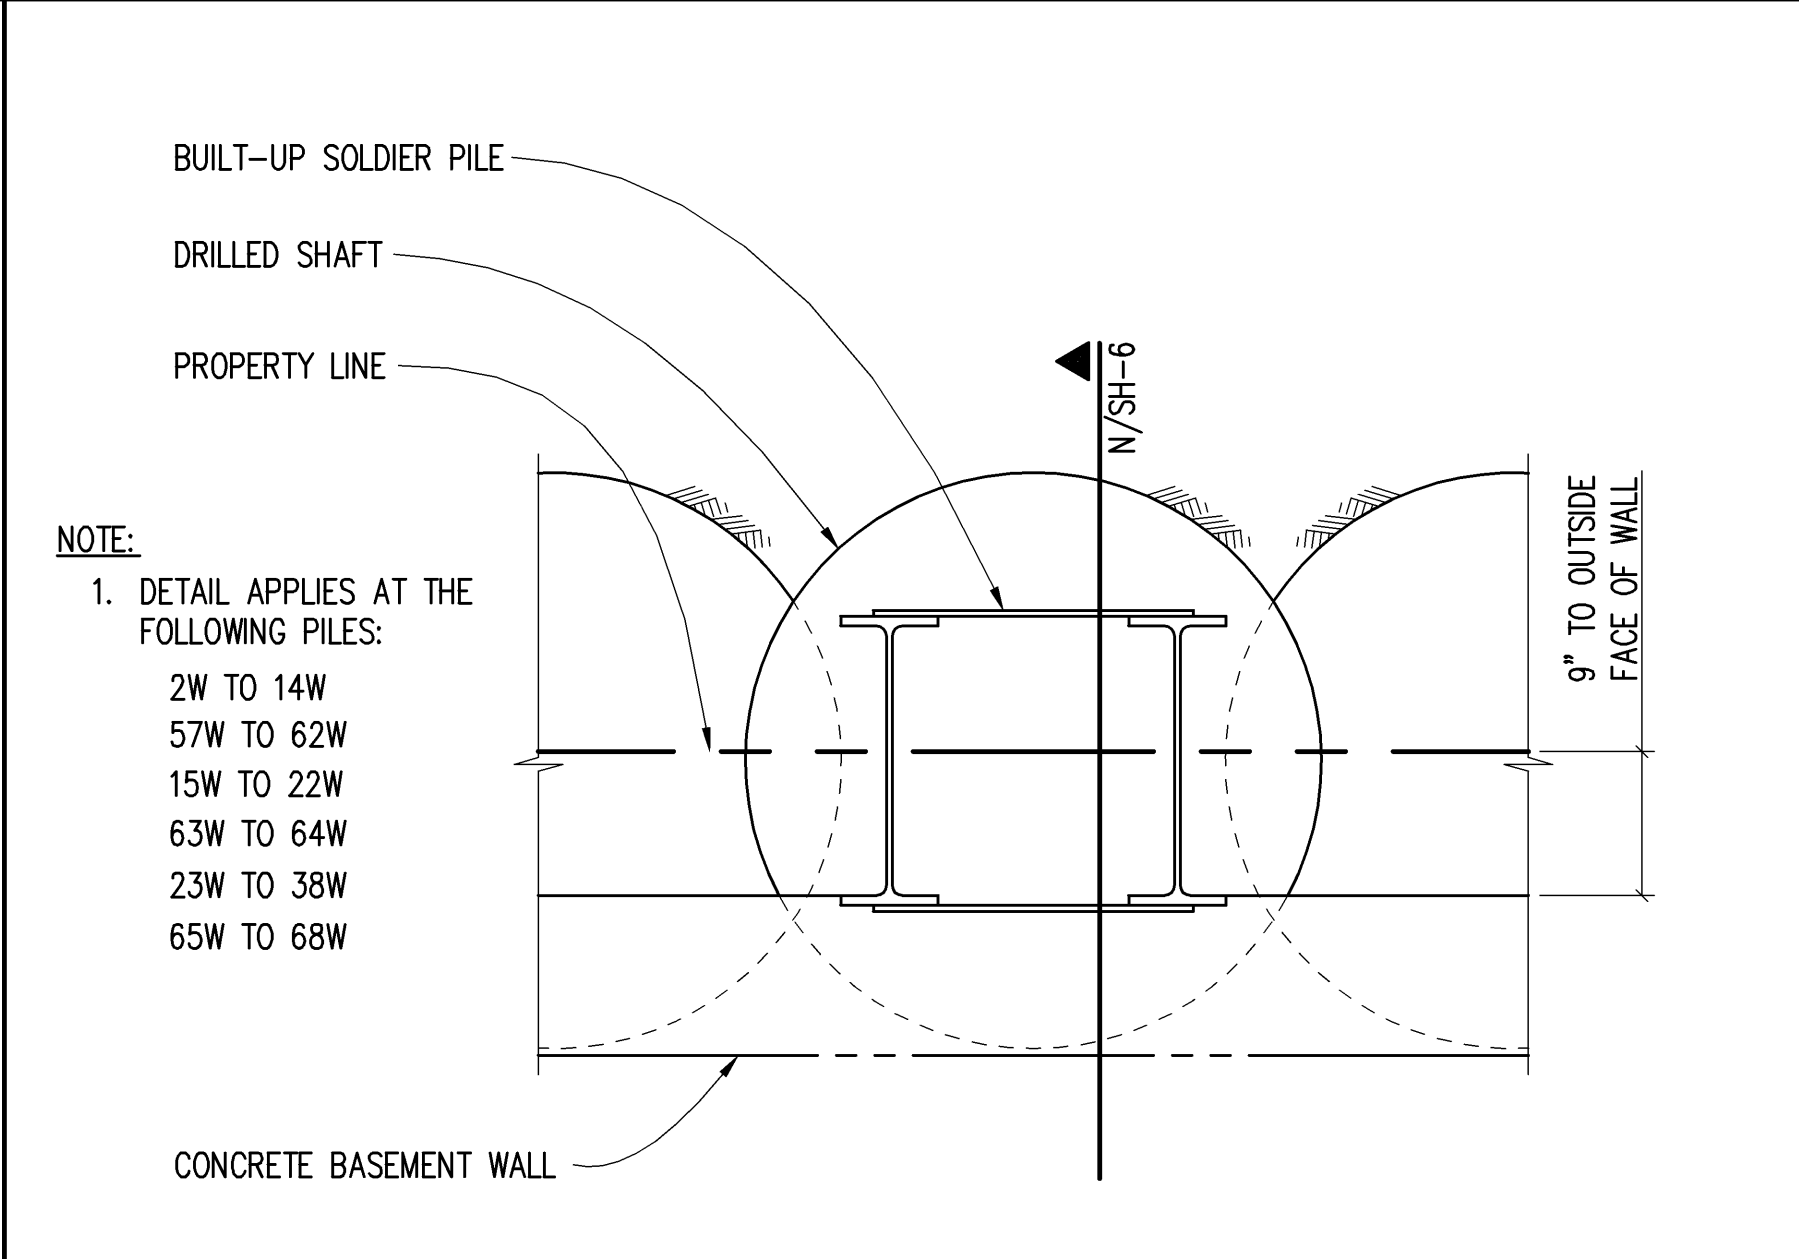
DETAIL AT SHORING AT D-10 1/2"=1'-0" D
